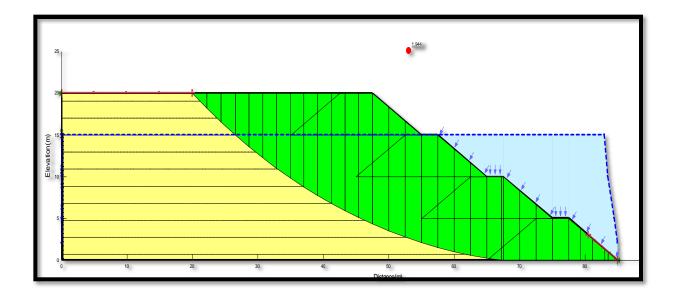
Embankment cross section for 1:1.5 slope at 15 m water level
